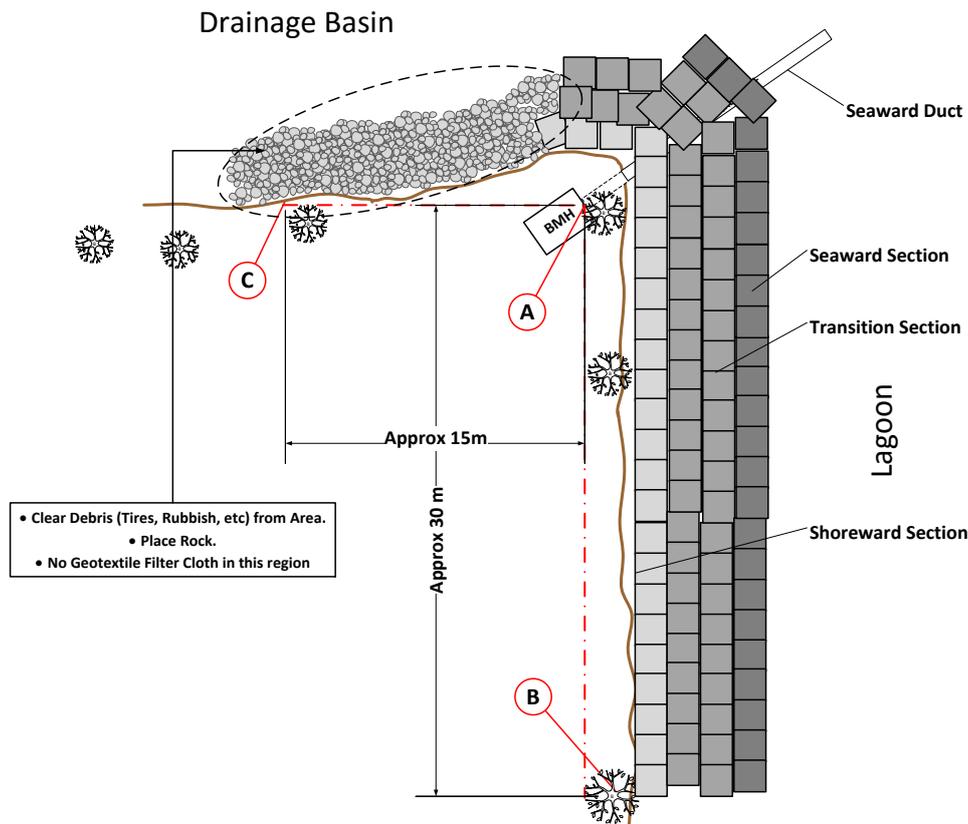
Interlacing of Concrete Blocks and Placement of Local Rock
